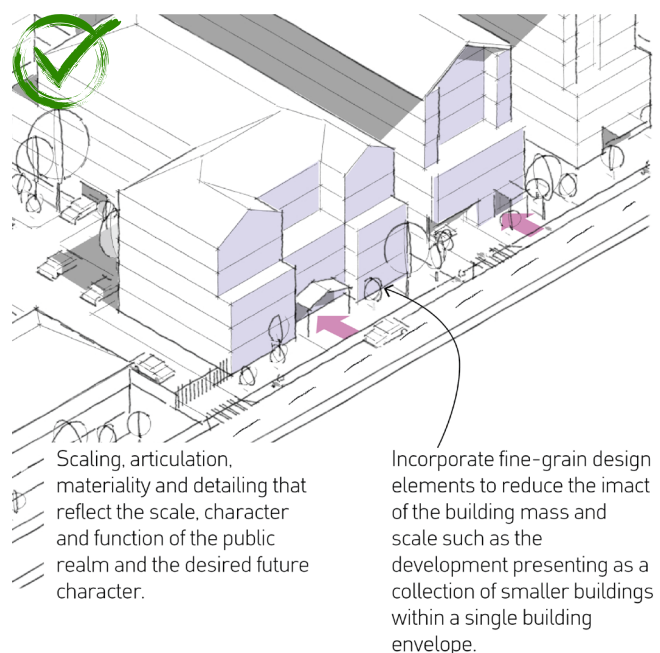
Multiple Dwellings - Façade Design Example Diagram
